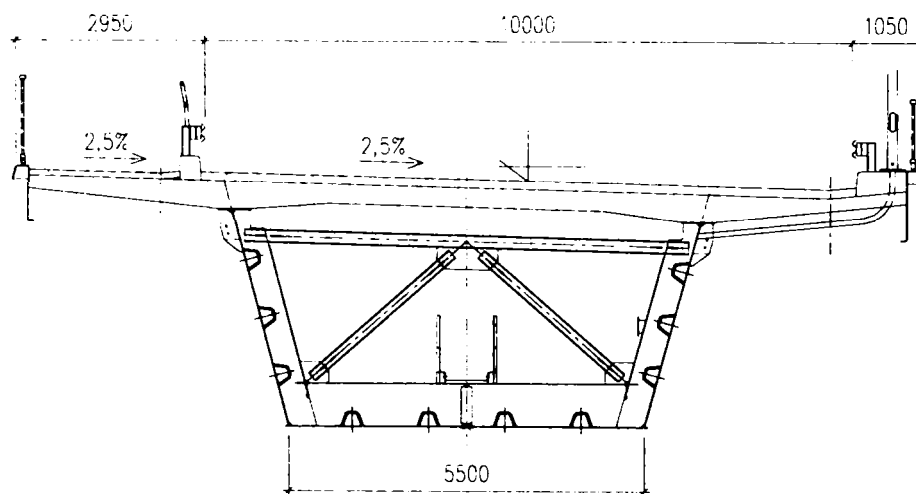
The cross section of the floodplain bridge at Szekszárd over the Danube
